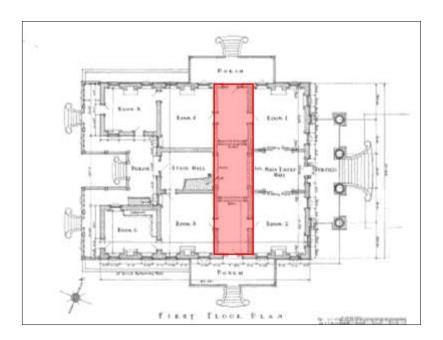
16: Floor Plan of the First Floor of Homewood Mansion, Stanton Hall, 1857 (Historic American Buildings Survey Drawing, 1936).
